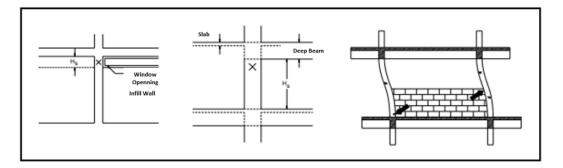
Short Column Formation due to Masonry or Infill Walls Source: (Celep, 2000)
